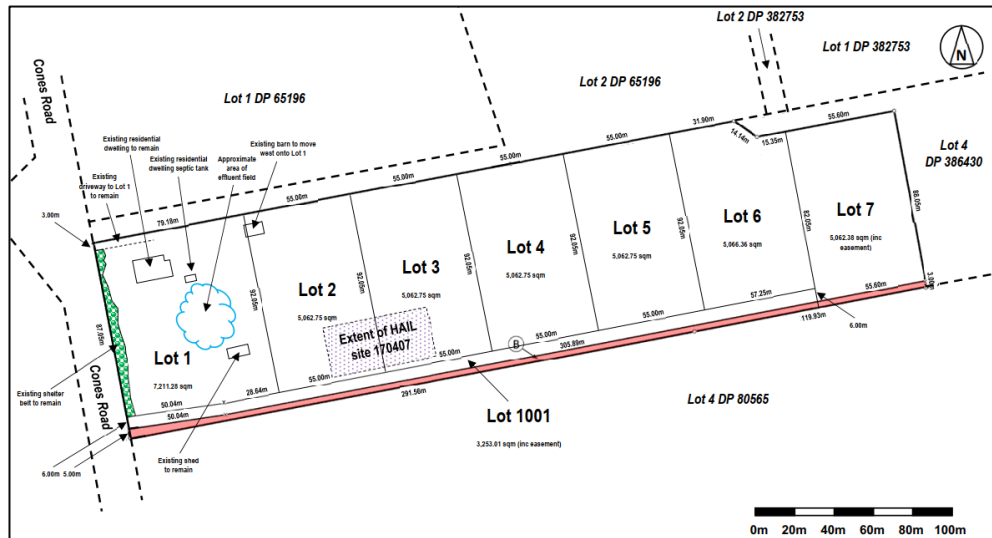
308 Cones Road Proposed Subdivision Layout. Town Planning Group August 2022.
